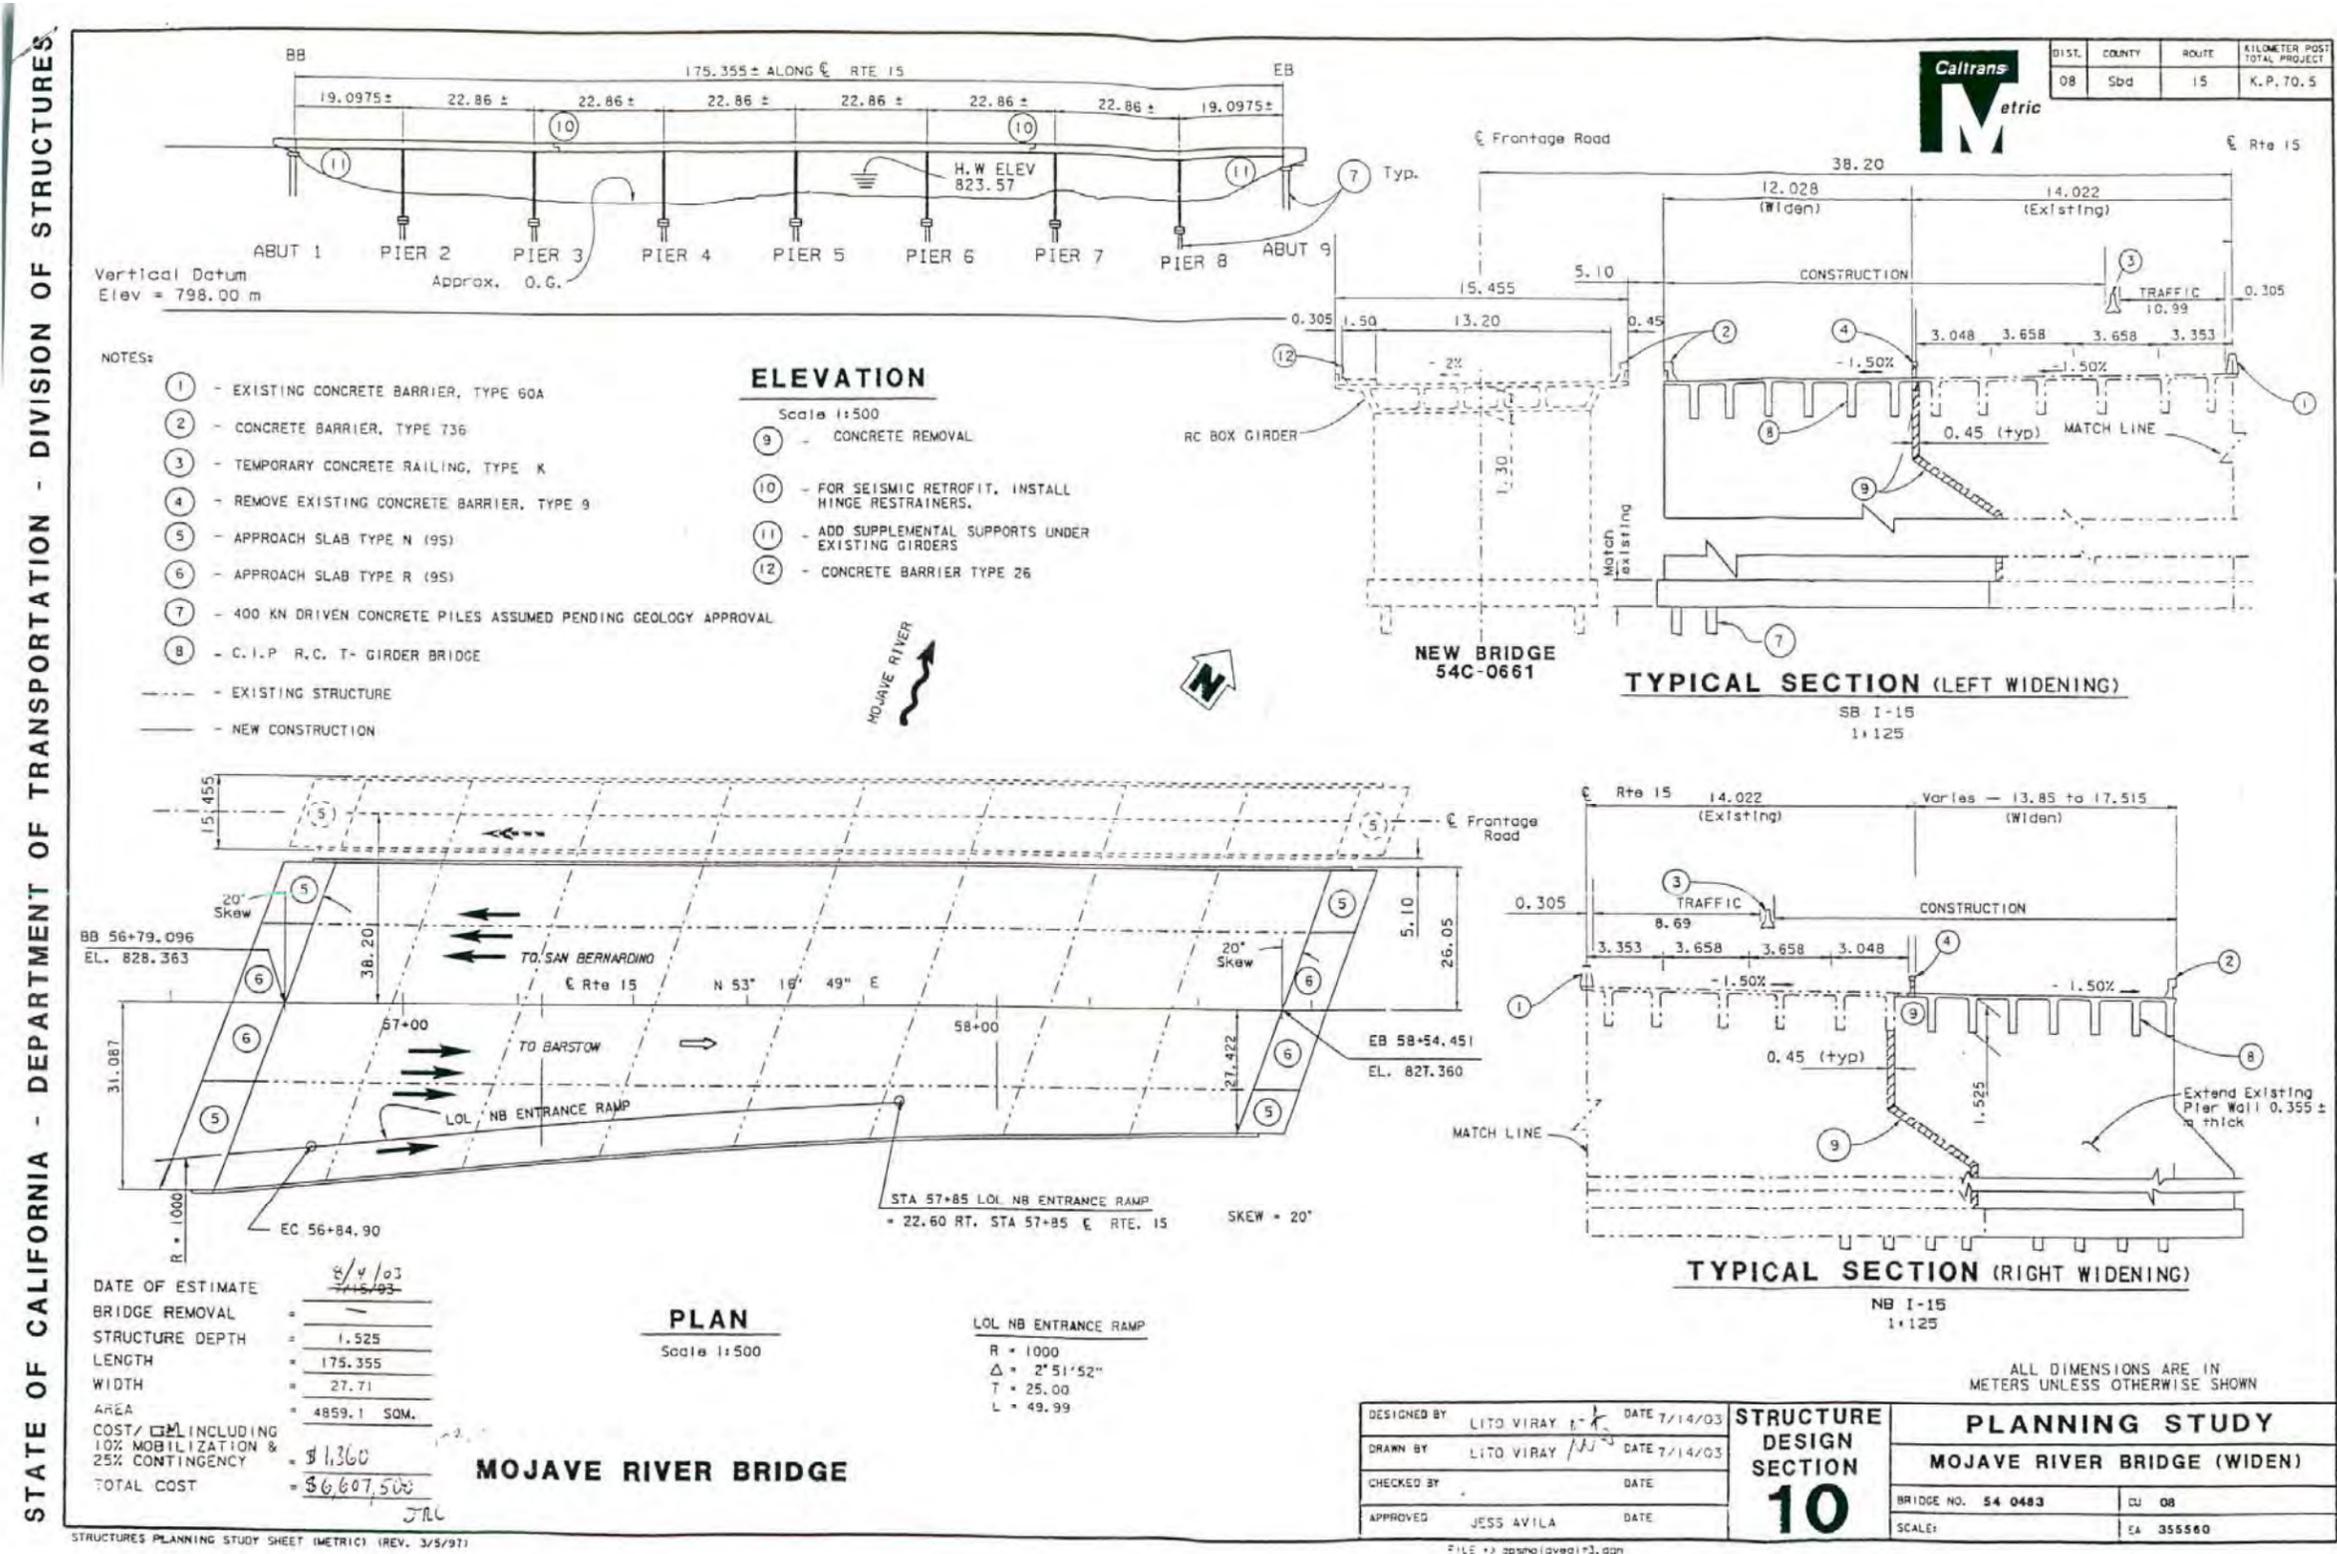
C. Plan, Elevation, and Typical Cross Section of Proposed Mojave River Bridge
